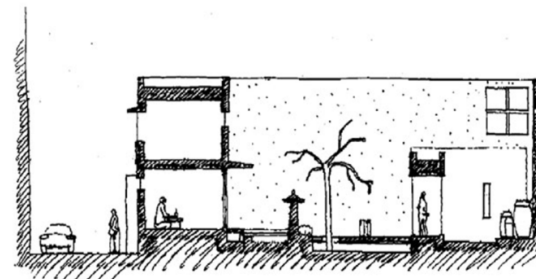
Section drawing of Sujoldang. ©IROJE Architects & Planners. Source: Seung (1993).
